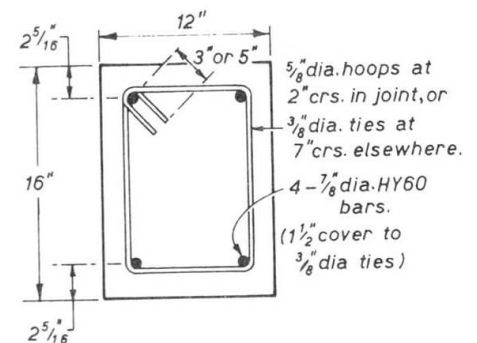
Column Section of Units 1, 2 and 3 (1" = 25.4 mm).
